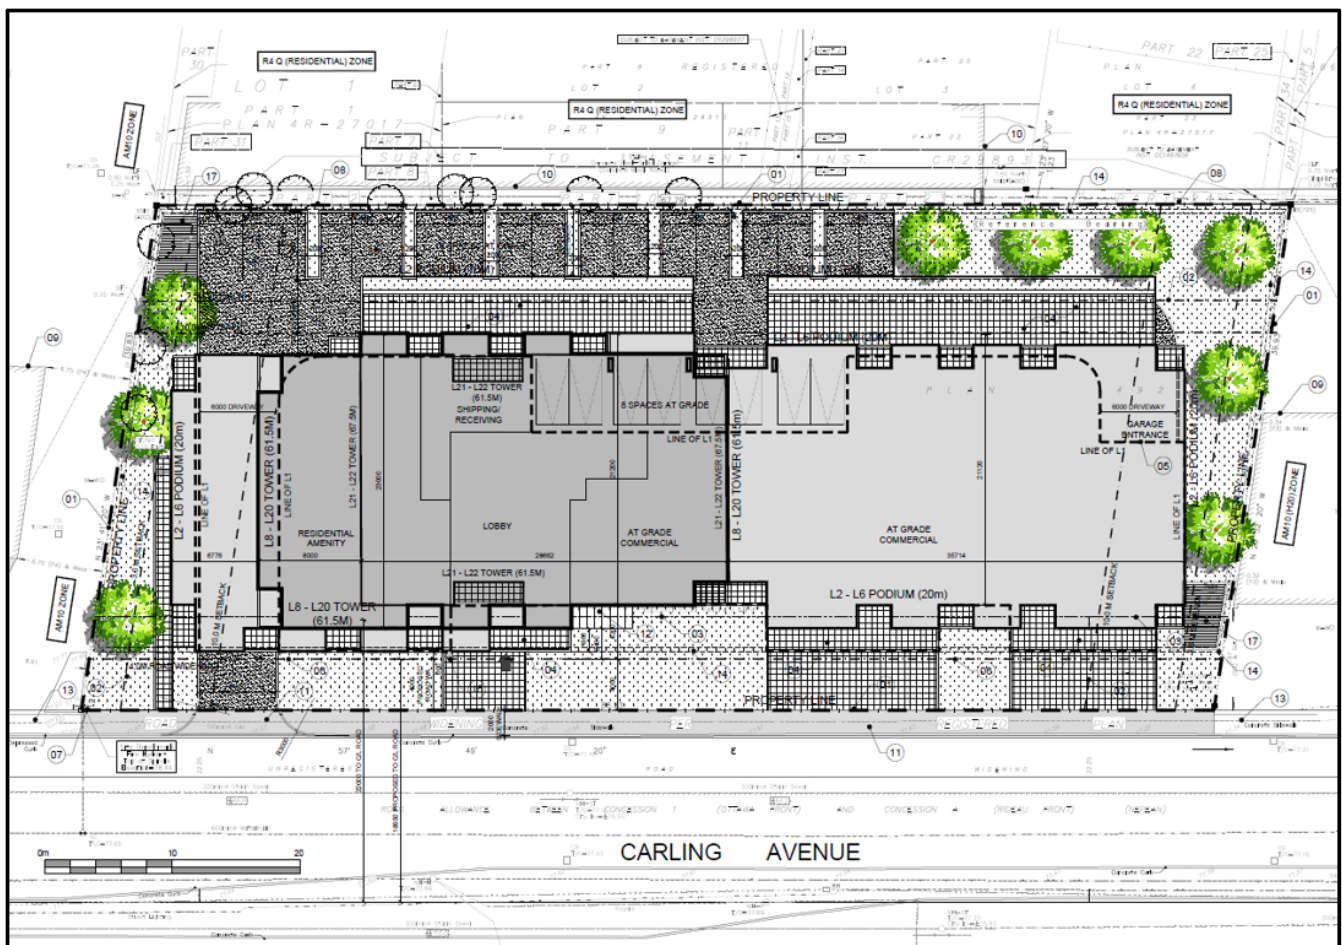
Conceptual site plan for the proposed development at 1655 Carling Avenue.
